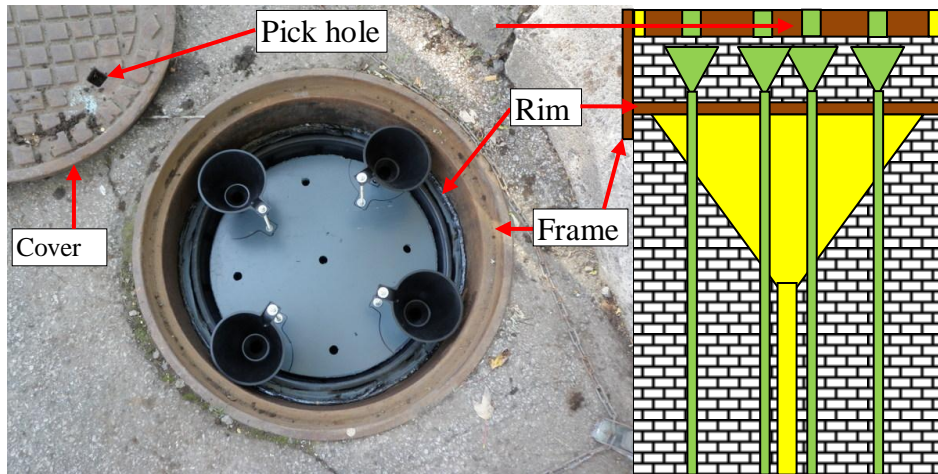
Testing device for collection of runoff volumes entering a valve vault (plan view photo and schematic elevation diagram)
